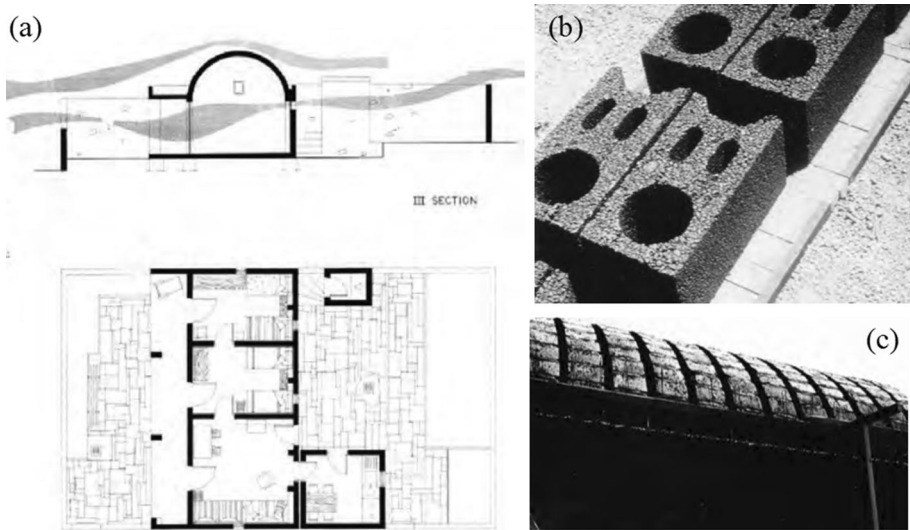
a Cross section and plan view of a type of aseismic vault; b cement–pumice cellular bricks; c construction of bricked vaults (Dekavallas 2013)
